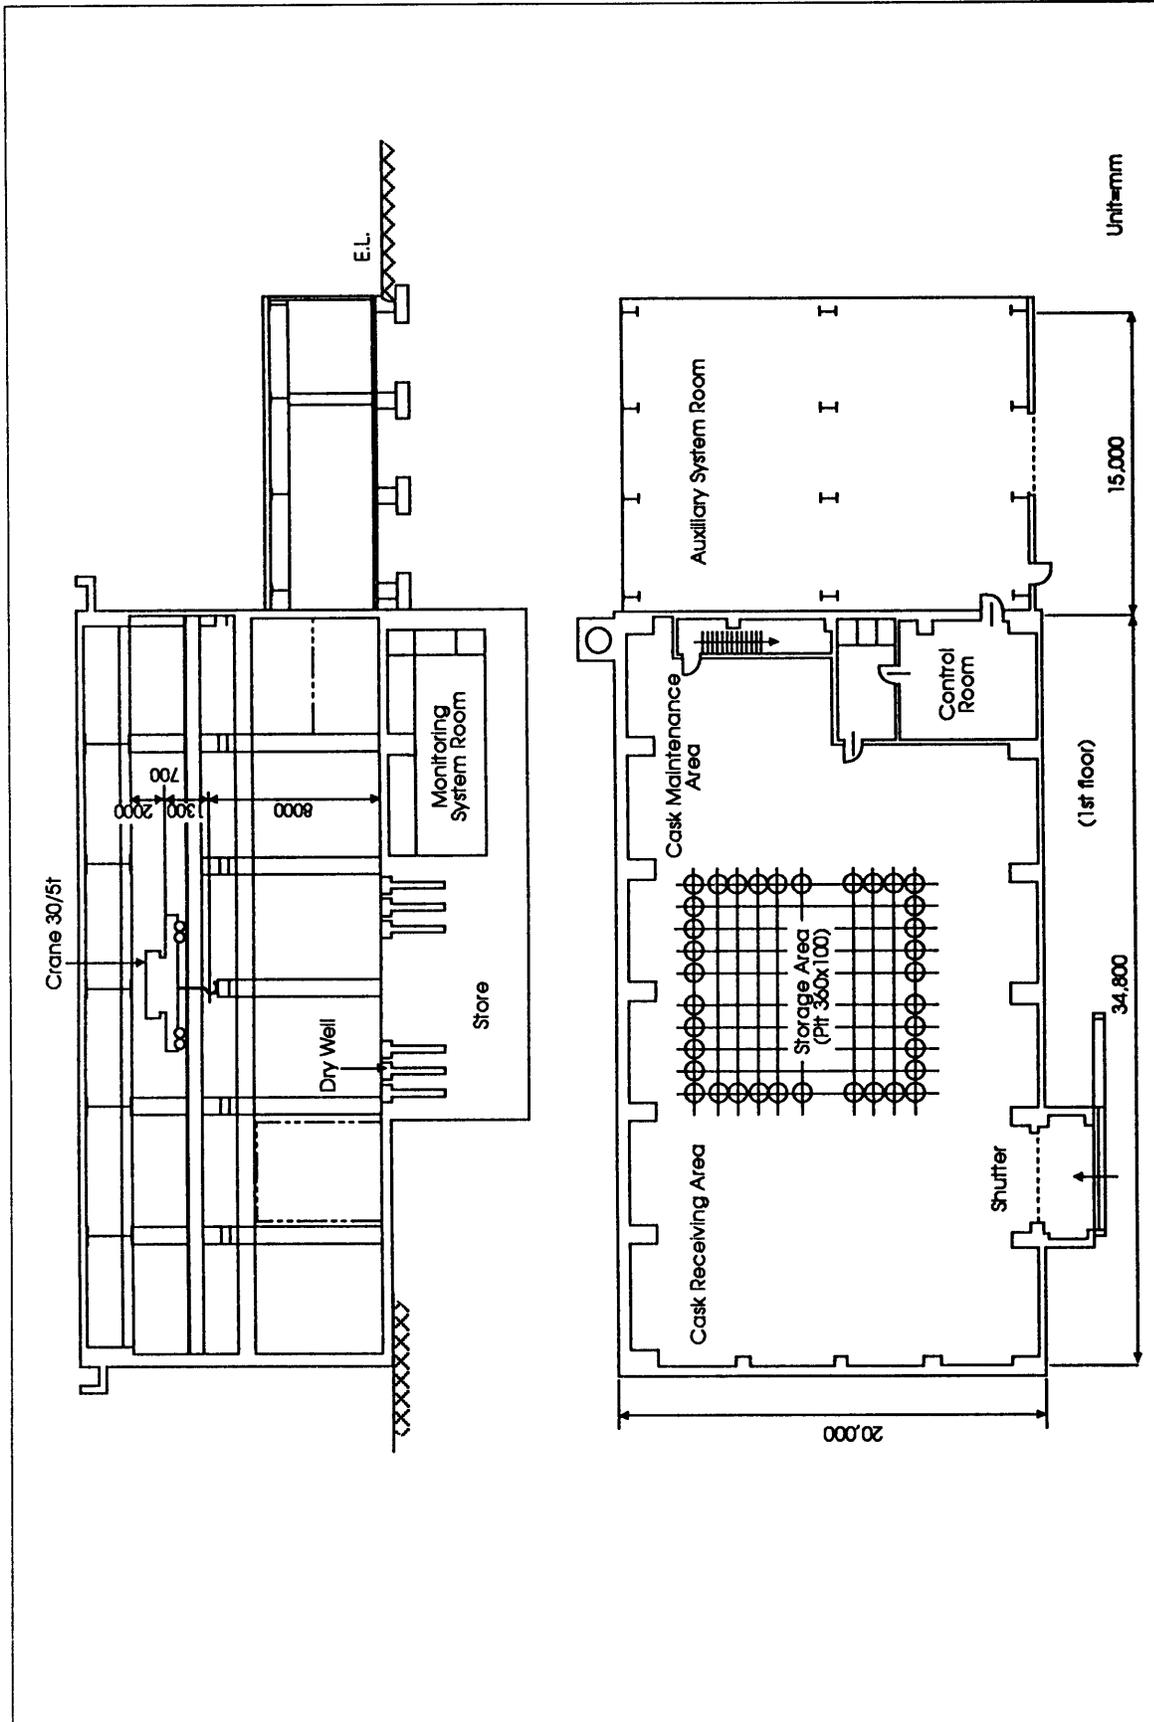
General Arrangement of Dry Storage Facility at Tokai, Japan
